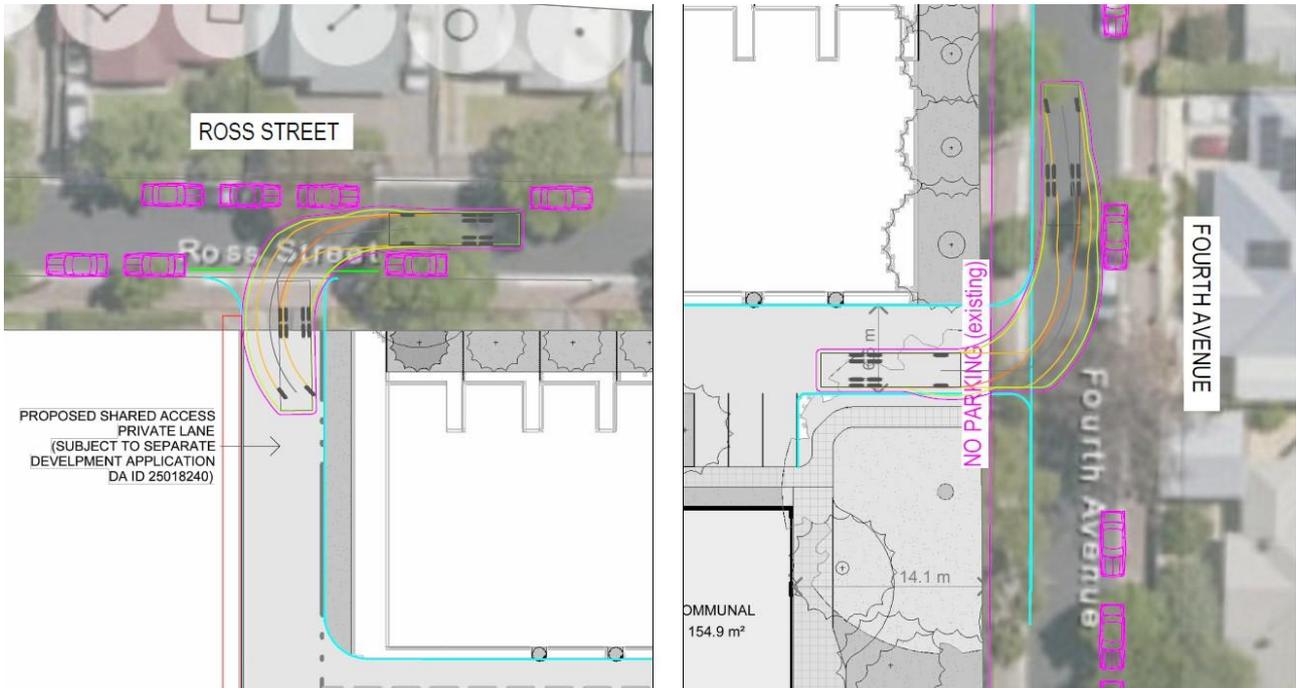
Refuse vehicle entering the site via Ross Street and exiting via Fourth Avenue
